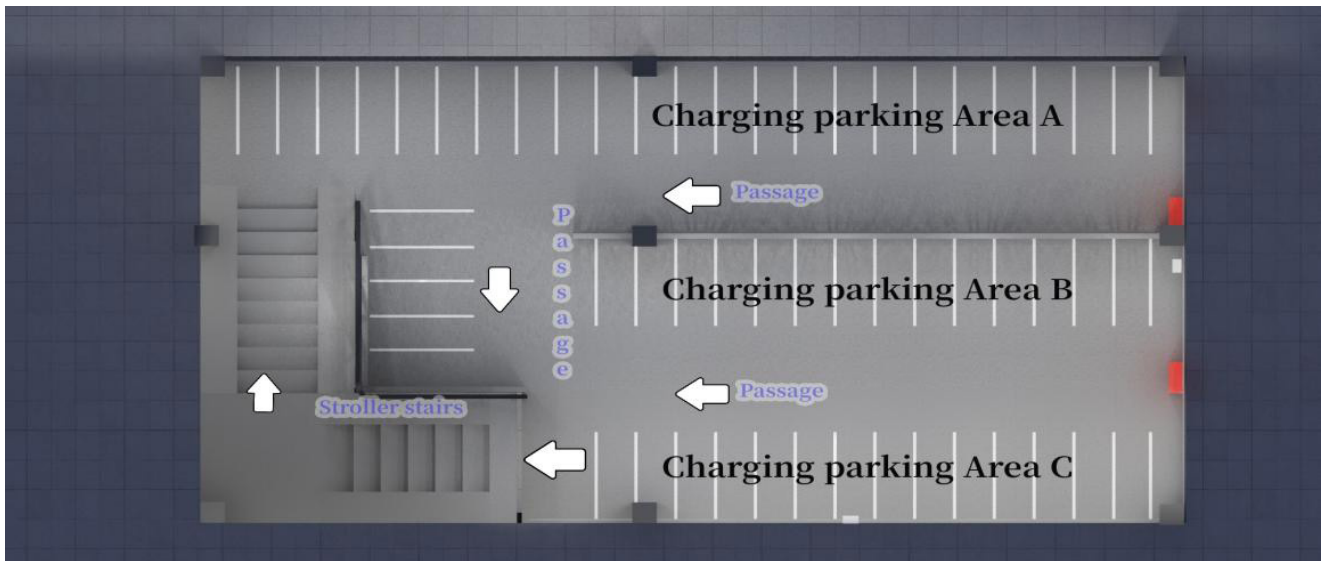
The second-floor layout of the prefabricated multi-story electric bicycle parking lot (Source: Design by Liya Fang)
